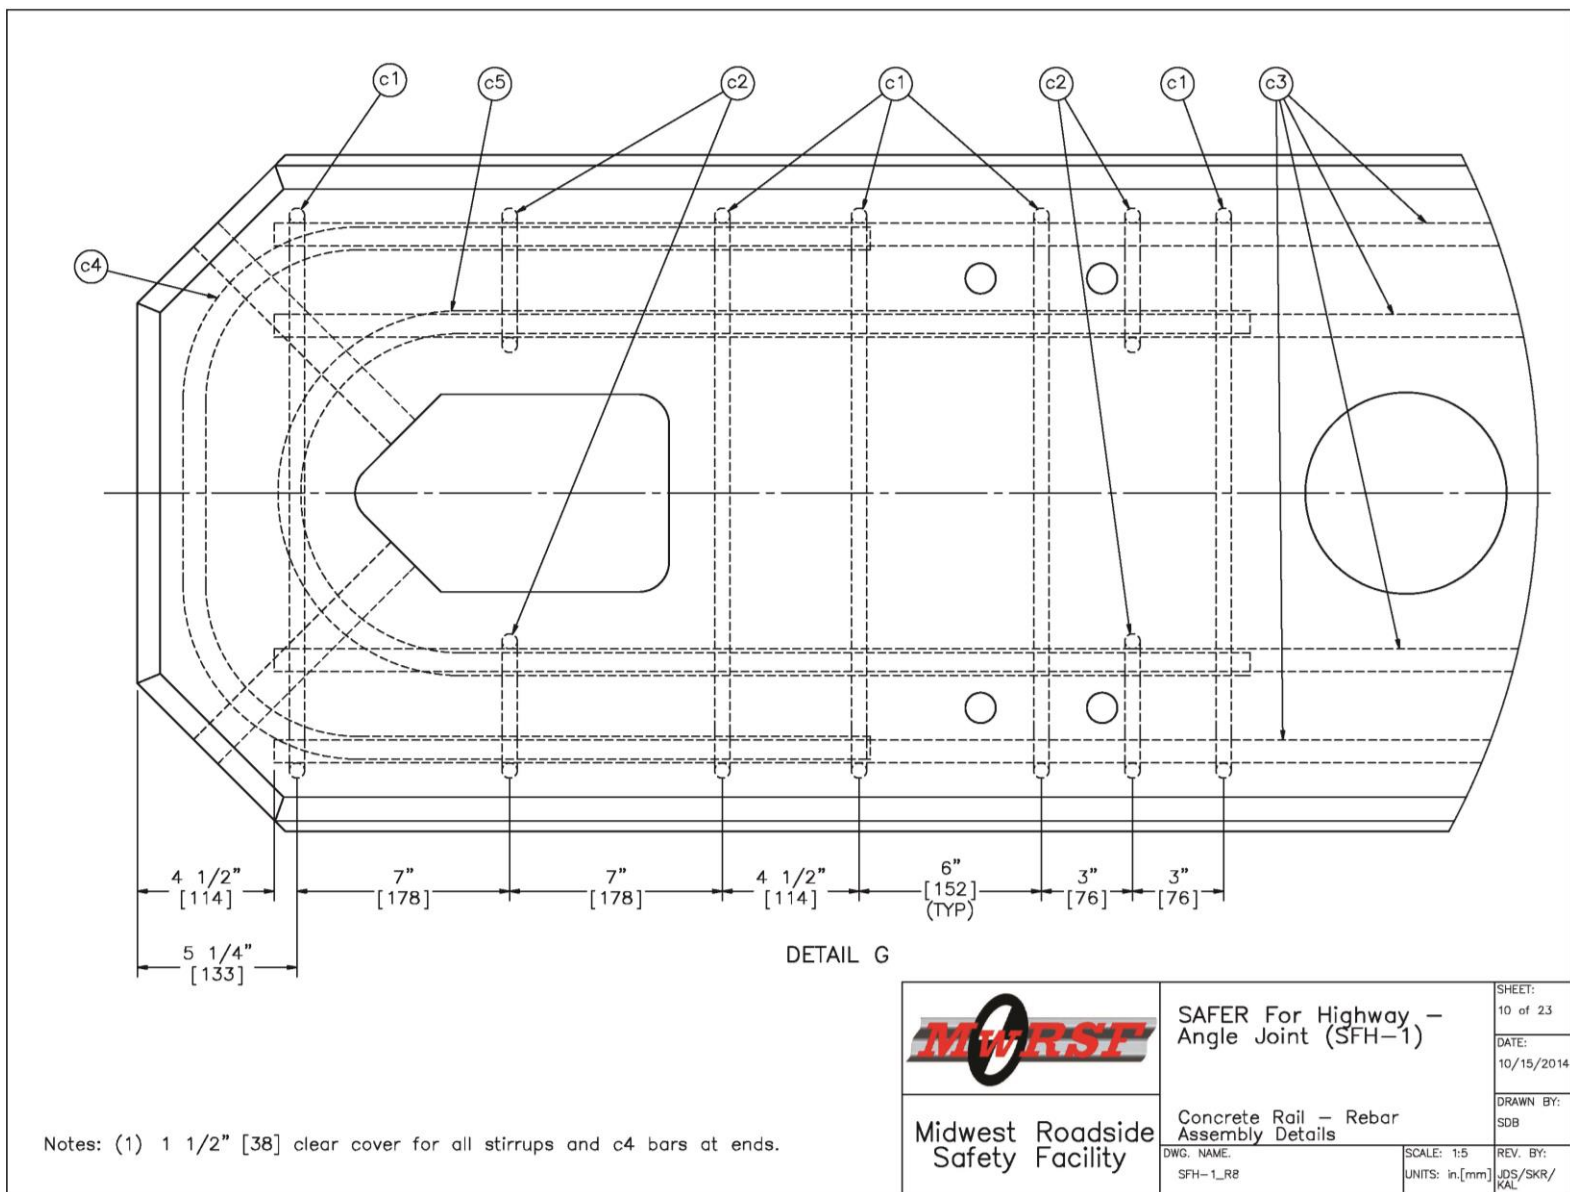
Recommended Barrier Design for Full-Scale Crash Testing, Concrete Rail Details
